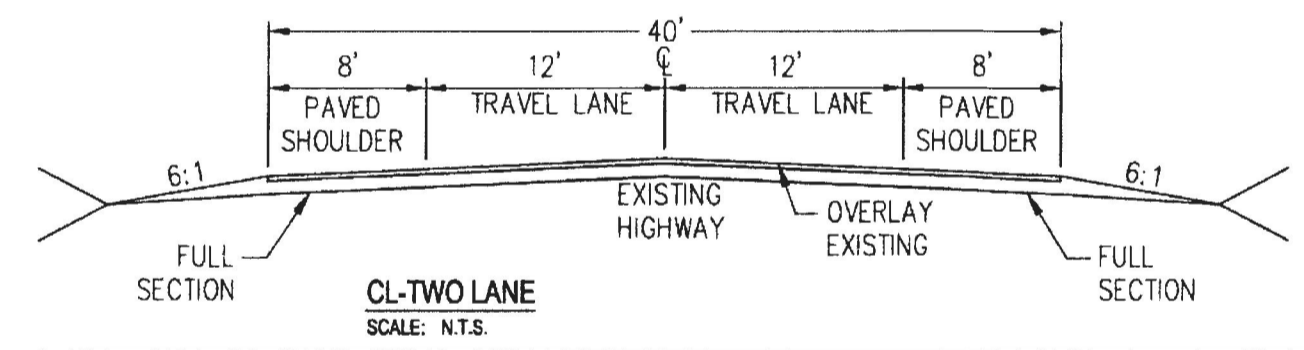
Crook County line to Millican Road basic roadway cross-section.
